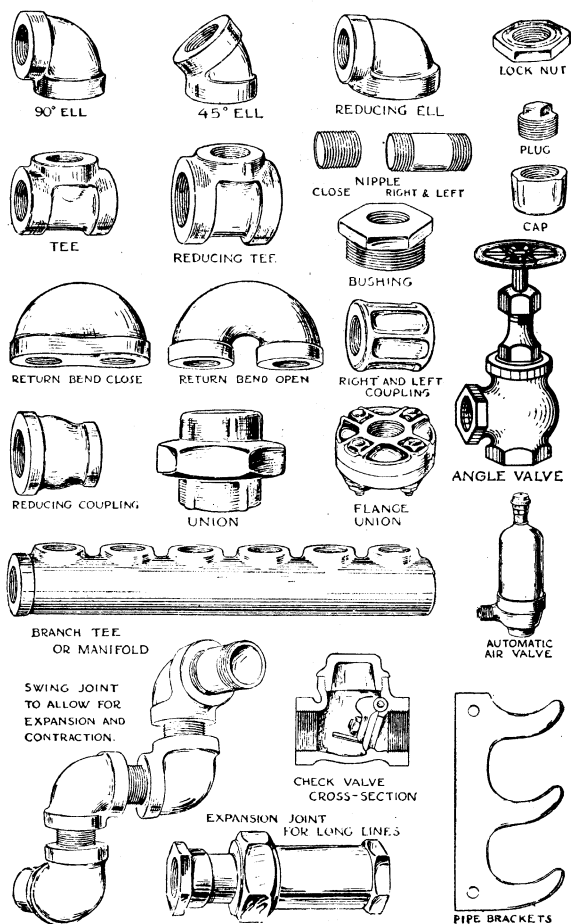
Some of the fittings used in the steam and hot-water heating systems of greenhouses.
